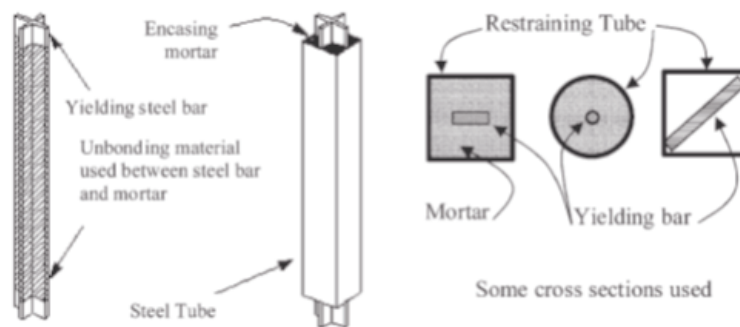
Some Typical Details for Buckling Restrained Braces (Sabelli *et al.*, 2003).
